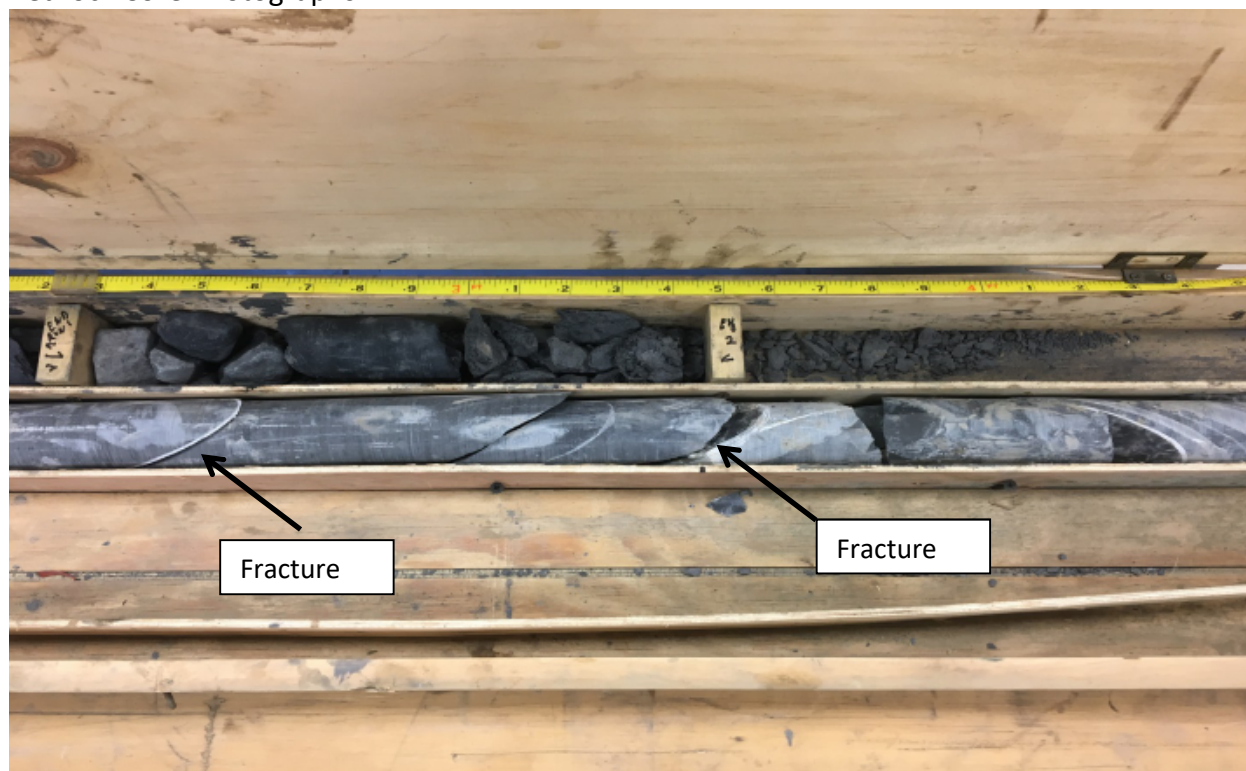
Boring B-4: Core Run 1 (63.5' – 66.0') and Core Run 2 (66.0' – 67.8'). Note: B-4 core recoveries low. Boring B-3: Core Run 1 (93.5' – 98.5')
